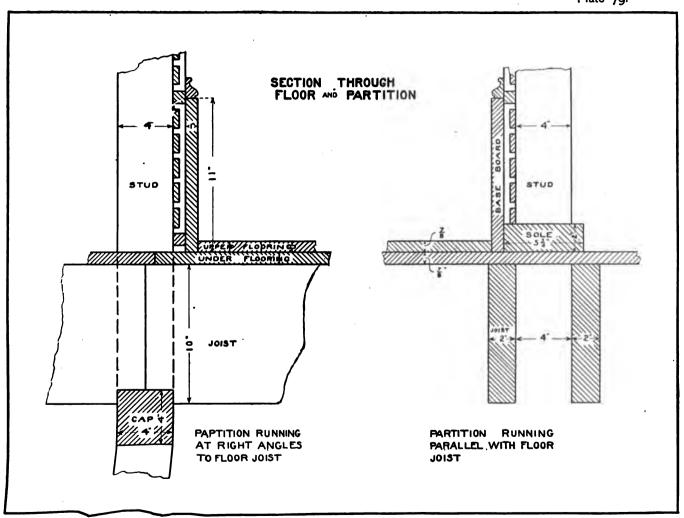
The drawing on the left portion of the sheet represents one of the best methods of supporting the floor joists of the second floor upon the partition below. The studs of the second floor should be allowed to extend through between the joists (as shown in the drawing), thus resting directly on the cap, and not upon a sole laid on the under flooring.
